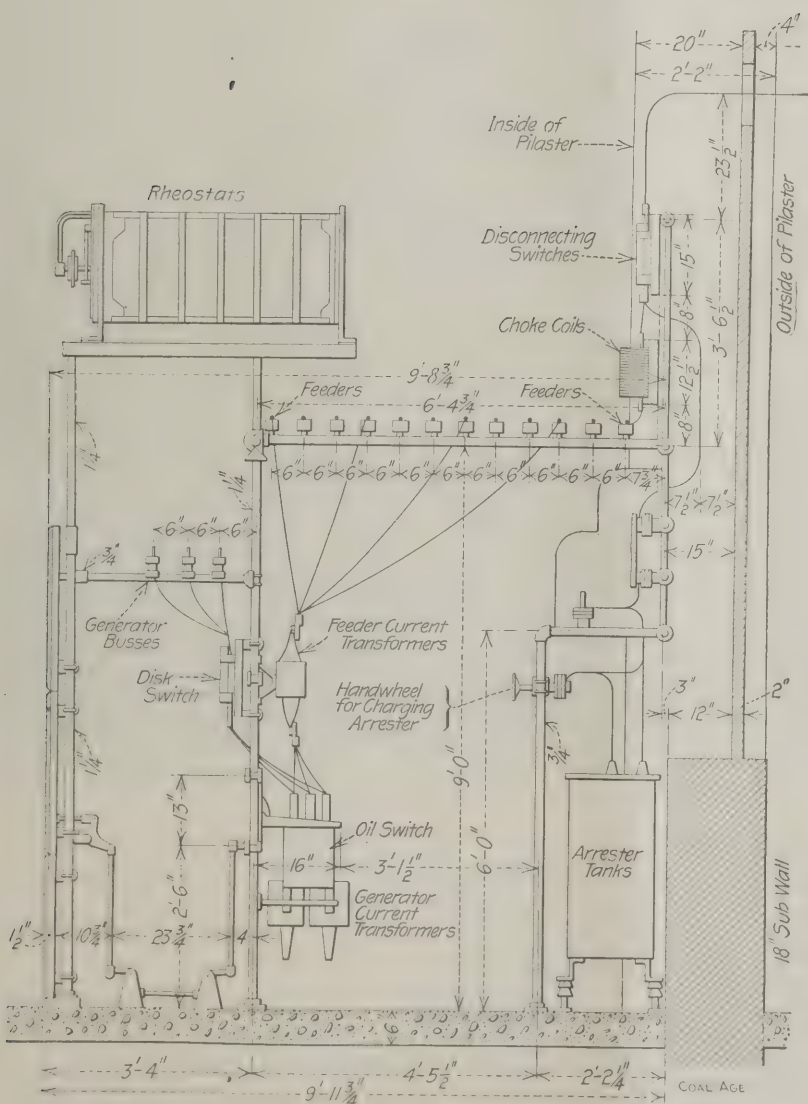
SIDE ELEVATION, SWITCHBOARD AND CONNECTIONS
